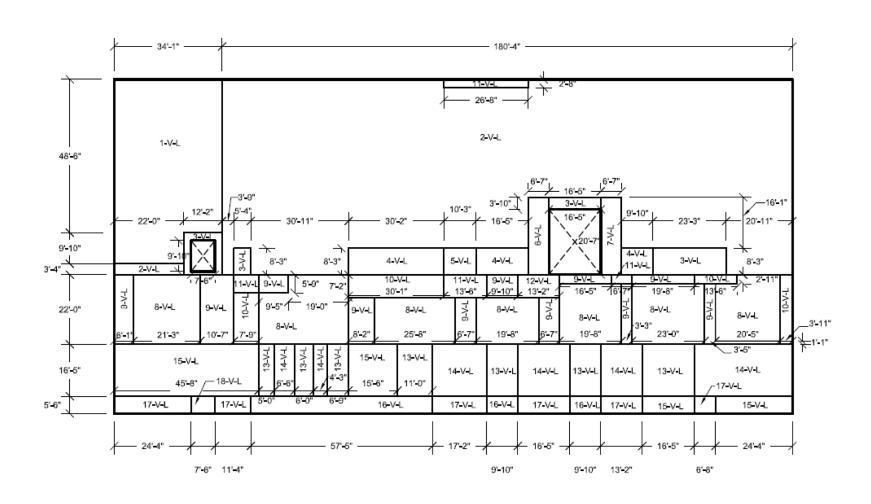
H.3-9 North Wall Looking South Vertical Reinforcement Zones Near Side Face
